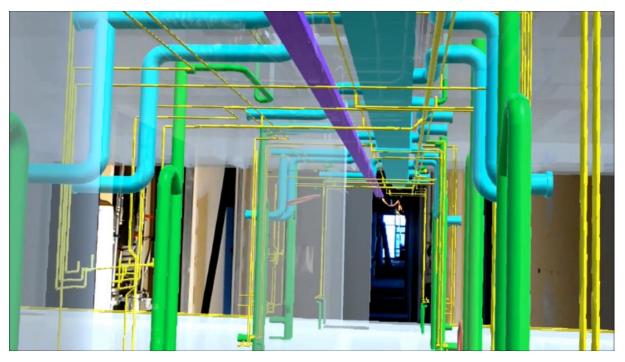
INSITER HoloLens BIM-based Mixed Reality App Screenshots – On-Site Demonstration focus on MEP or HVAC, (without walls and ceiling, structure half transparent, for example).
